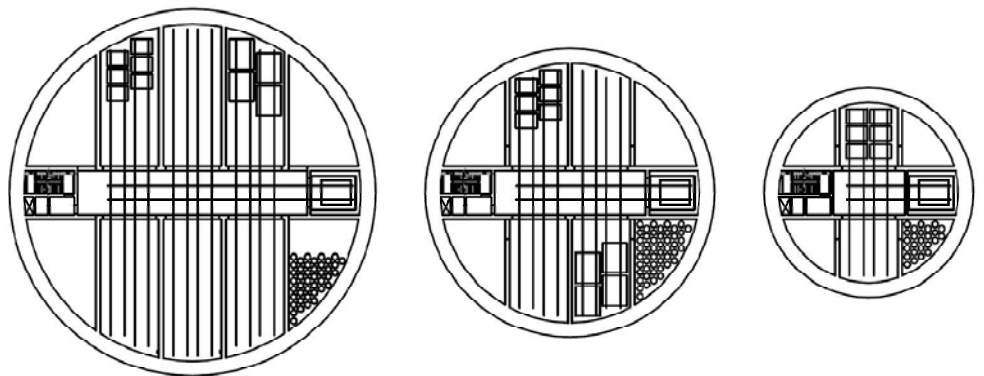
Ground plans of proposed designs for repository based on a shaft that is operated inside the repository. Inside diameters are 33.8 m, 26.0 m and 18.0 m. See drawings no. 1-06 to no. 1-11 in Appendix C for possible cut-off structures.
